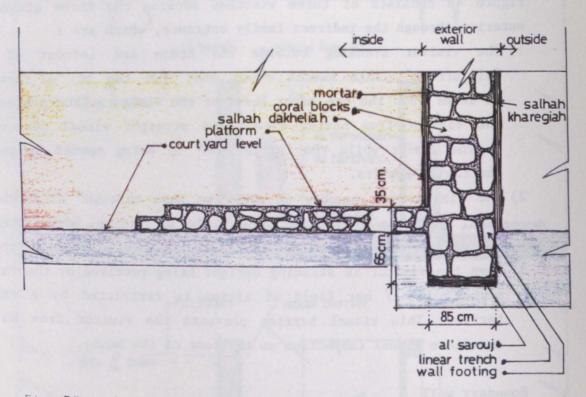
A sketch showing a section passing through anexterior wall, the platform and the wall footings .
